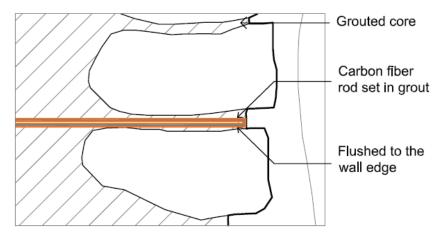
Illustration of the Detail of Grouted Anchor (Chaudhry' 07)
